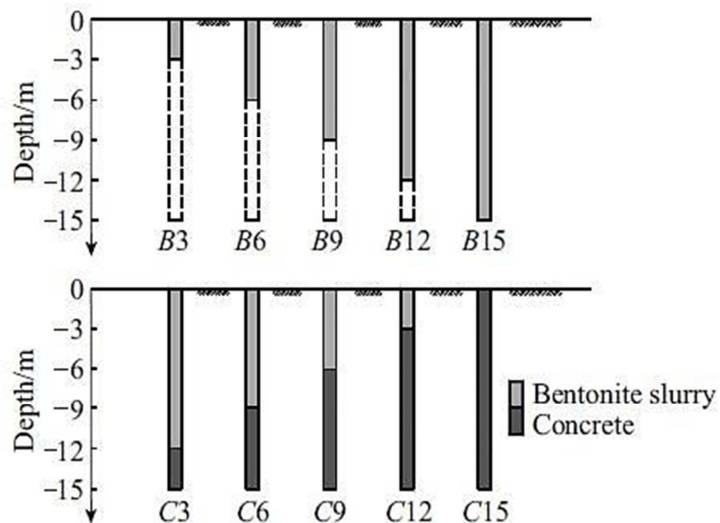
Modeling steps of constructing diaphragm wall panels (Ding and Wang 2008).
